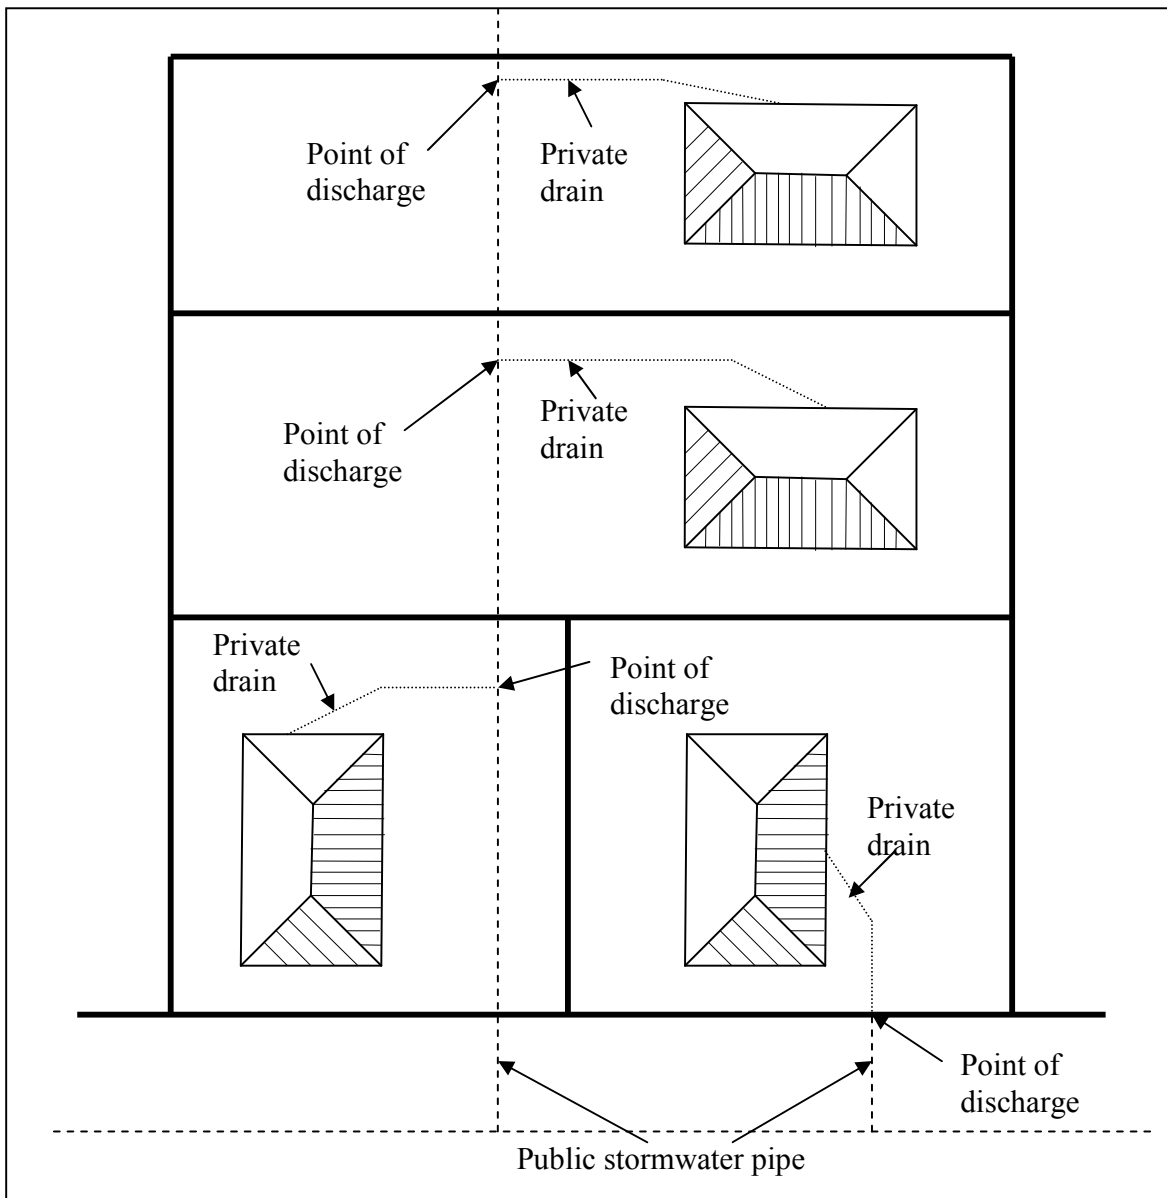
POINT OF DISCHARGE LOCATION - PUBLIC STORMWATER PIPE ON PRIVATE PROPERTY
